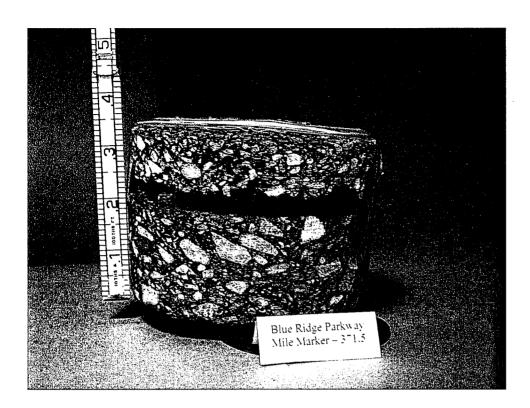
Additional Asphalt Cores Mile Marker 371.5
